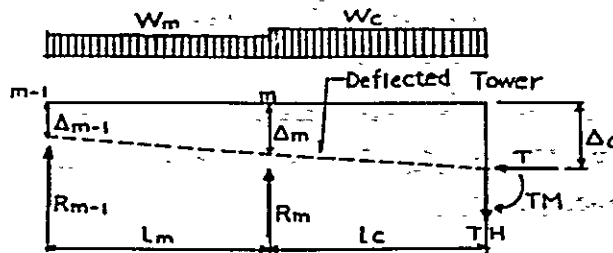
LOADS ON CANTILEVERED SPAN OF TOWER
